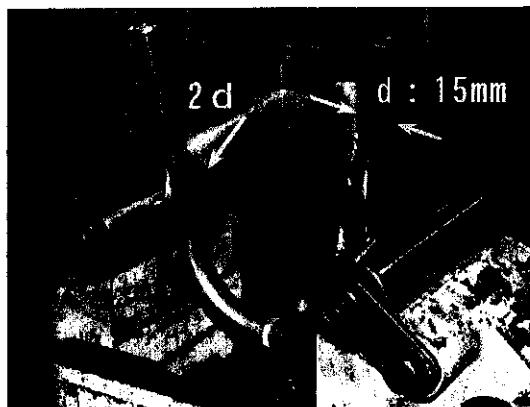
Appearance of 3 points bending test (Bending radius: 30 mm)
